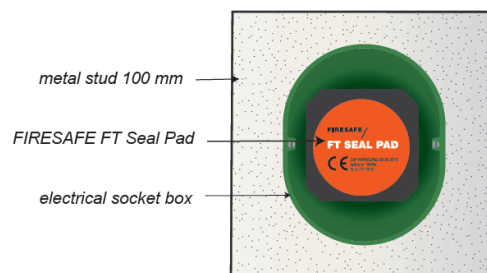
Single electrical wall box (size 1.5), fitted on one side of flexible wall – front view
